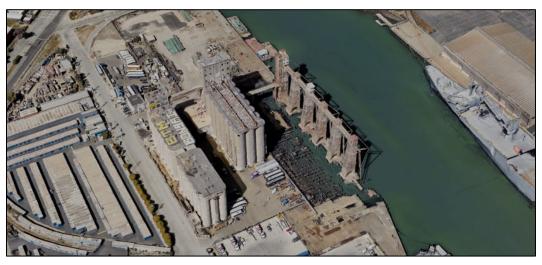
Pier 90 Maritime Terminal Site – Existing Condition
